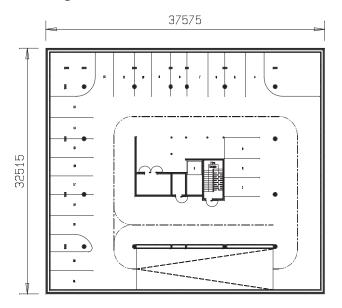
Upper Basement Floor Plan (Scale 1:500)
